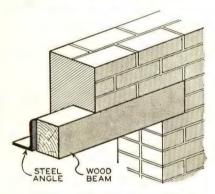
Steel Angle and Wood Beam Forming Lintel for Window in Eight-Inch Brick Wall
